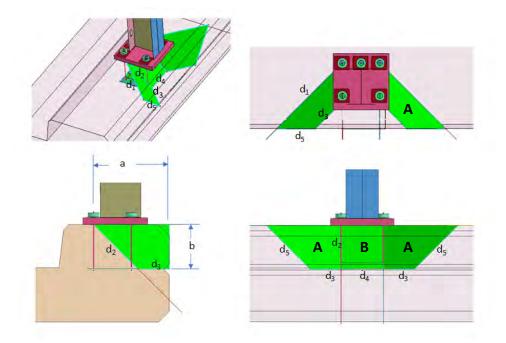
Approximated failure planes for push-out shear failure in concrete.
